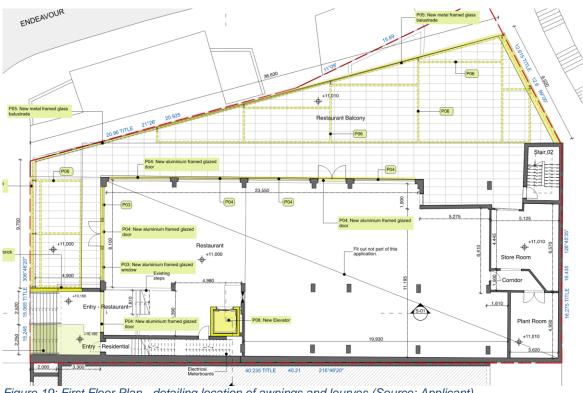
First Floor Plan - detailing location of awnings and lourves (Source: Applicant)
